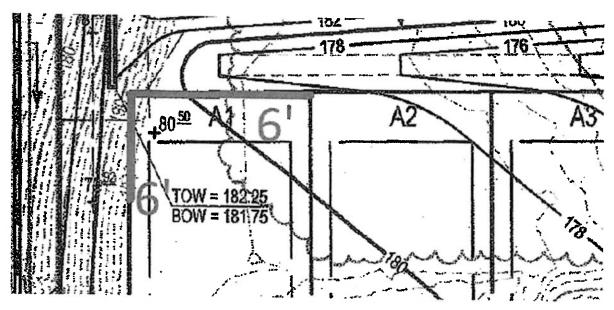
Recommended Noise Walls to Shield Rear Yards (Lot A1)
